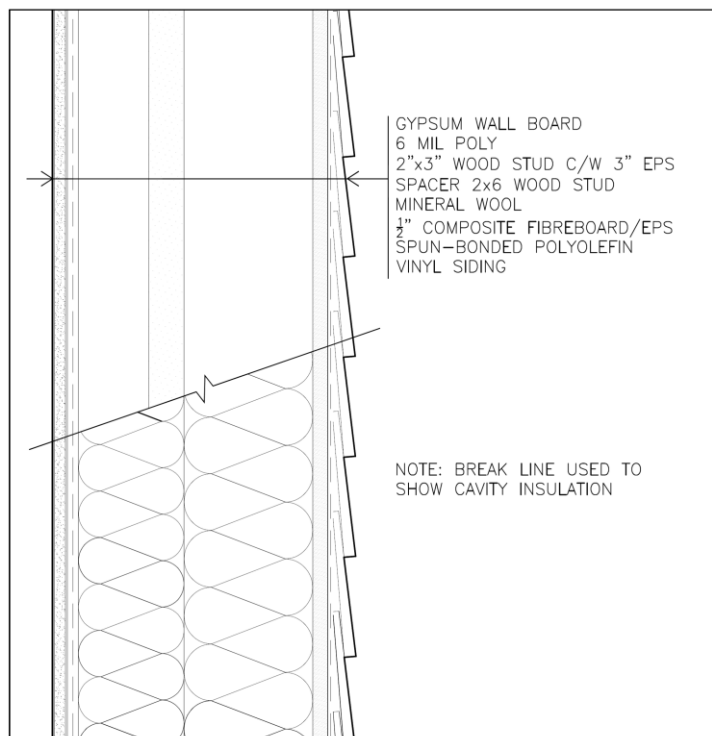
Wall Assembly Cross-Section (Twiddy, 2011)
